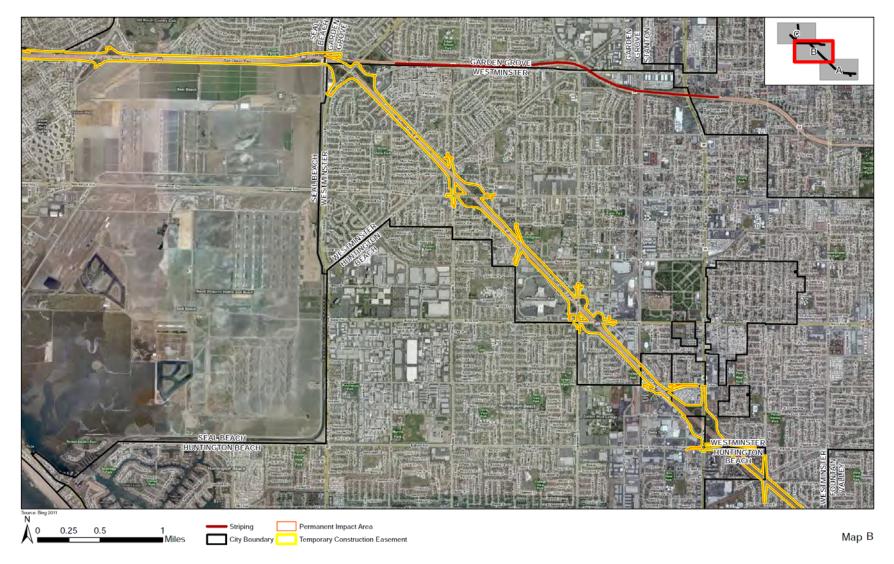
Proposed Project Construction Limits (Segment 2)
